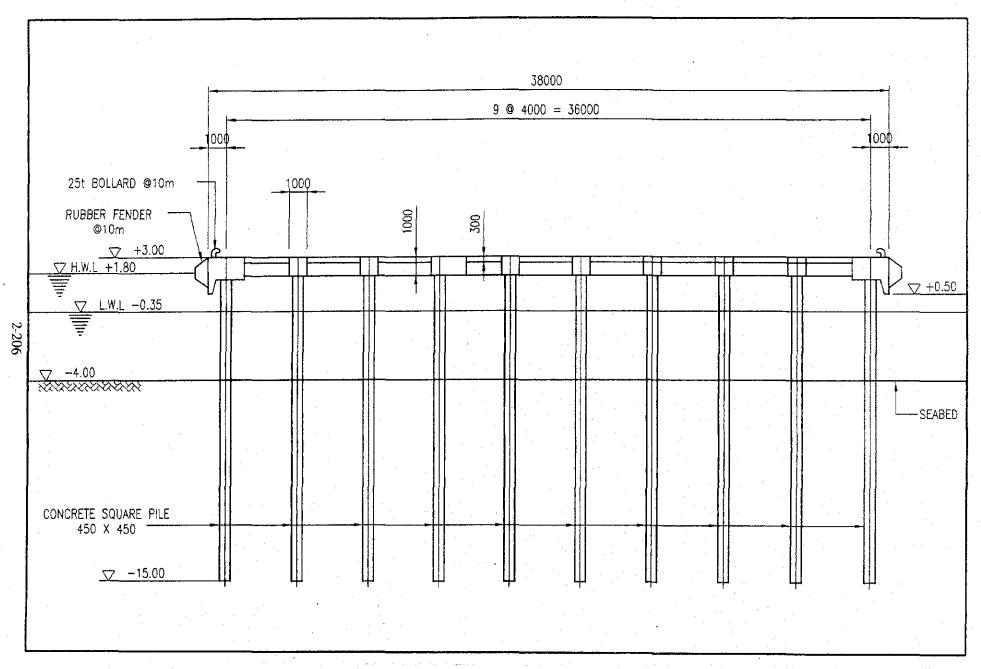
Open Deck type Berth for the New San Remigio Port
